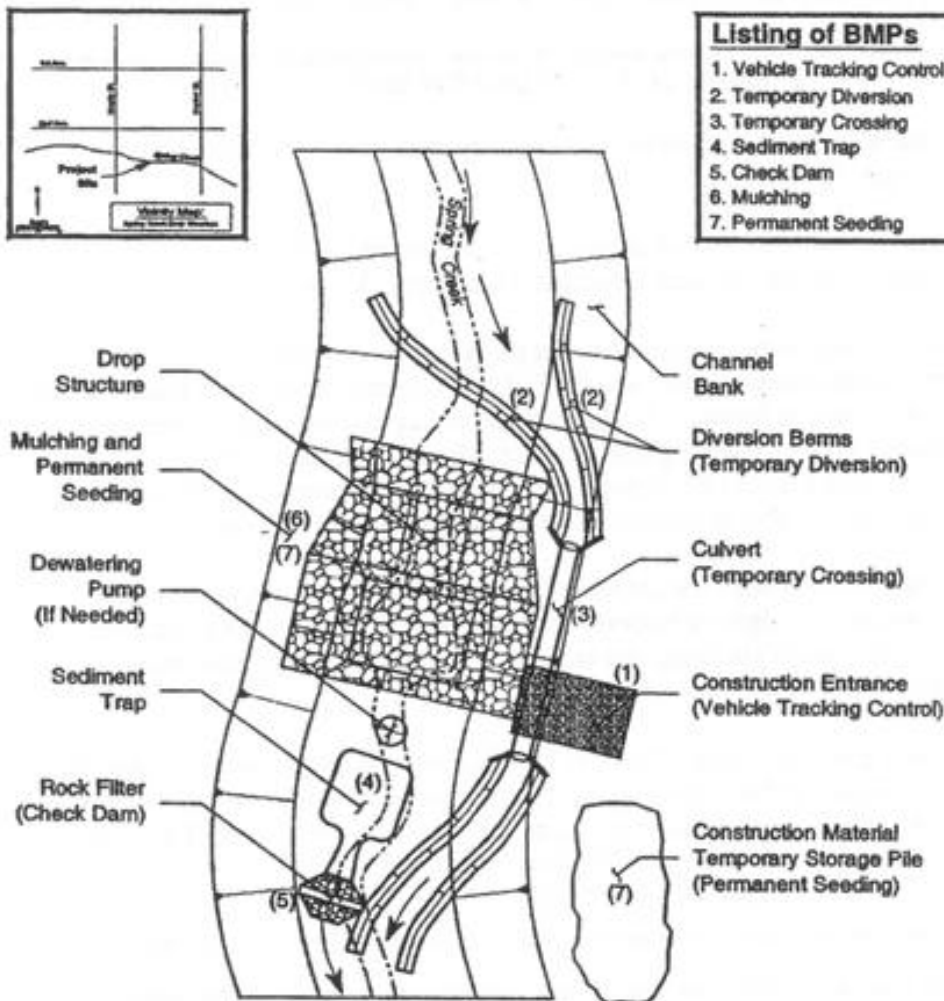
Example Site Plan showing BMPs for 401 Certification Project
